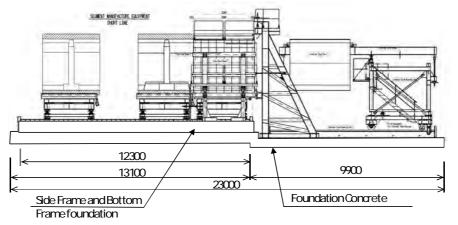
Short Line Equipment Foundation Side View
